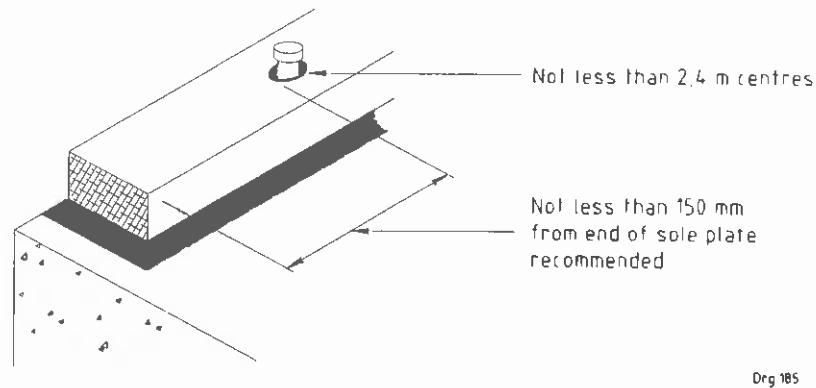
Fixing sole (sill) plate to brick/block foundation walls using bolts
